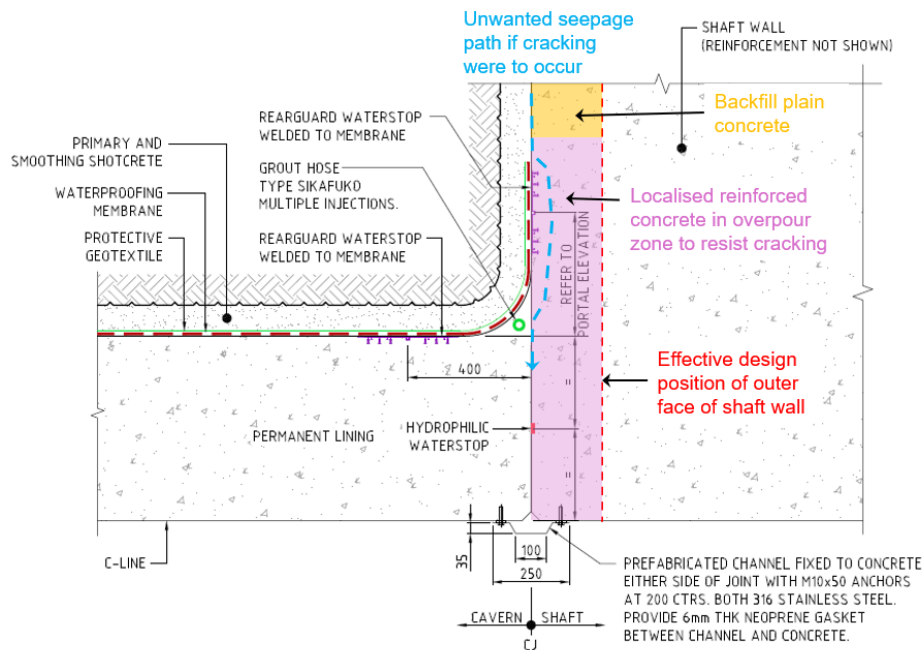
Cavern to Station Shaft waterproofing detail (long section)
